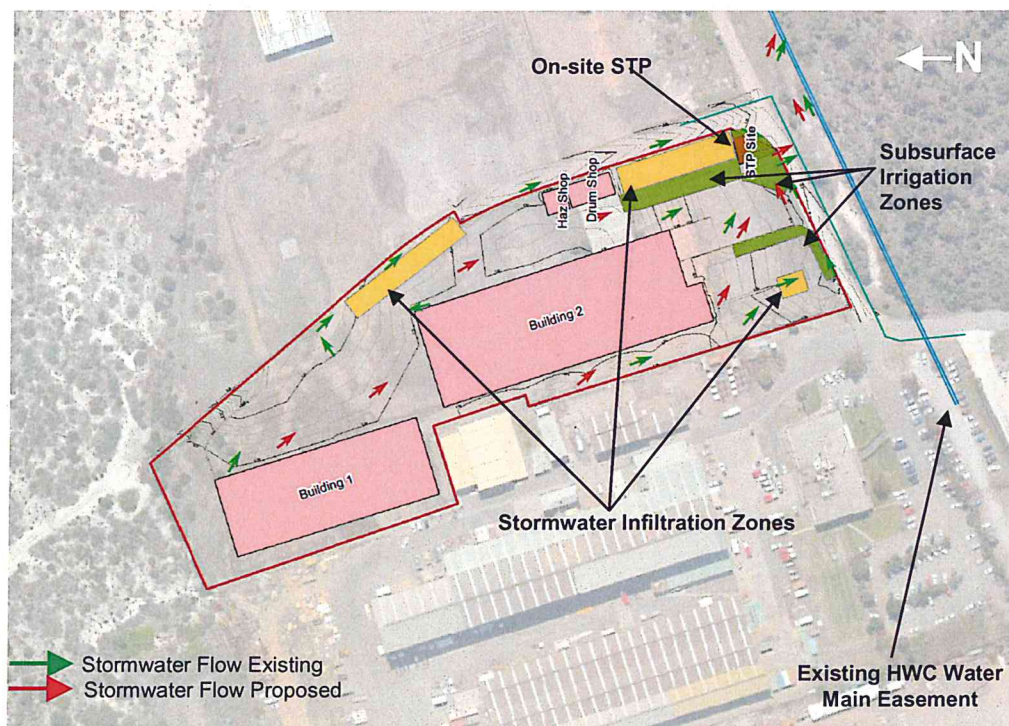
Proposed stormwater infiltration, subsurface irrigation and sewer layout
